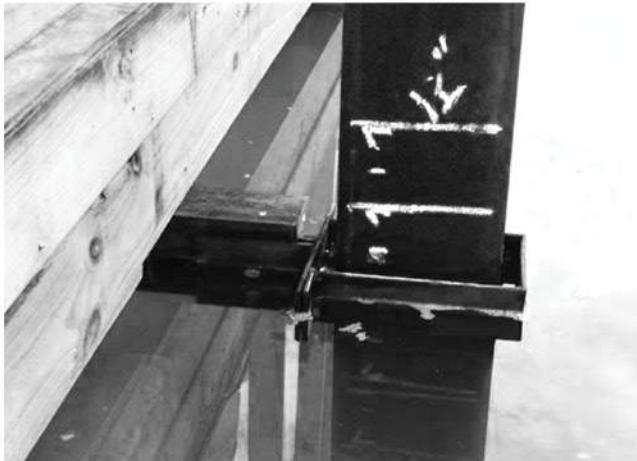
| Full-scale testing of prototype buoyant foundation system.
